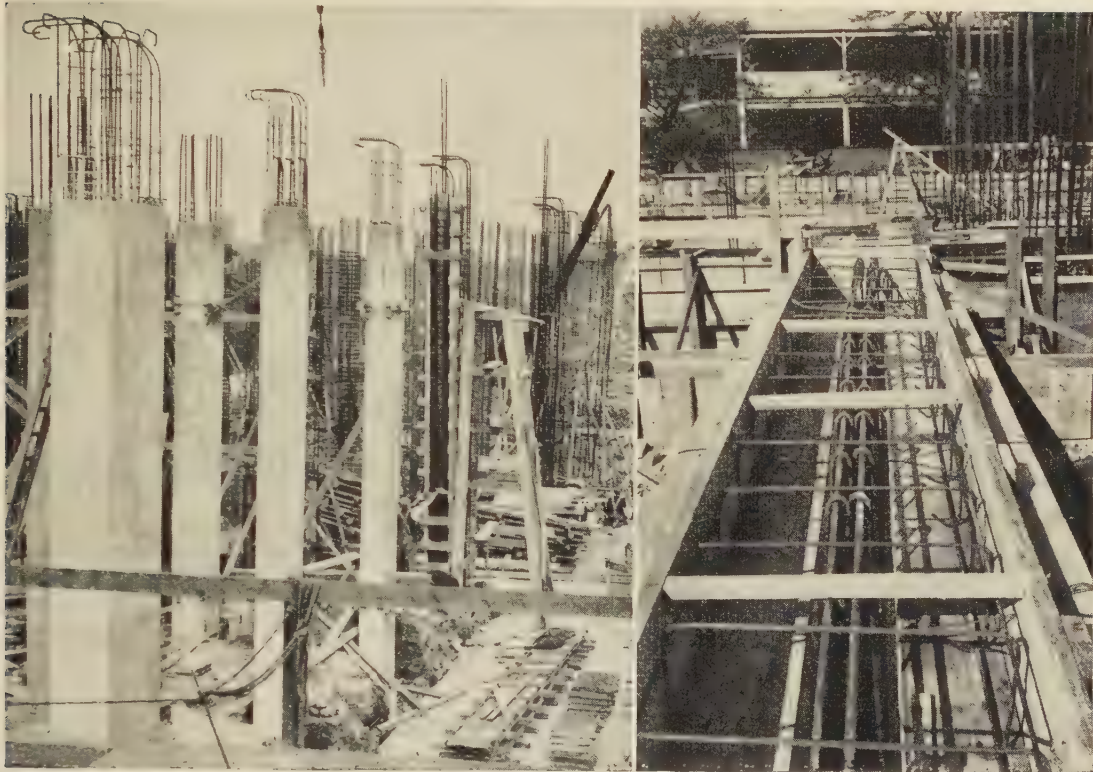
A concrete column is the opposite of a concrete beam and has to bear a heavy downward weight on a small surface. This diagram gives a view down the length of a concrete column. The heaviest steel bars are arranged upright and are joined by smaller bars to stop them from buckling or bending.
